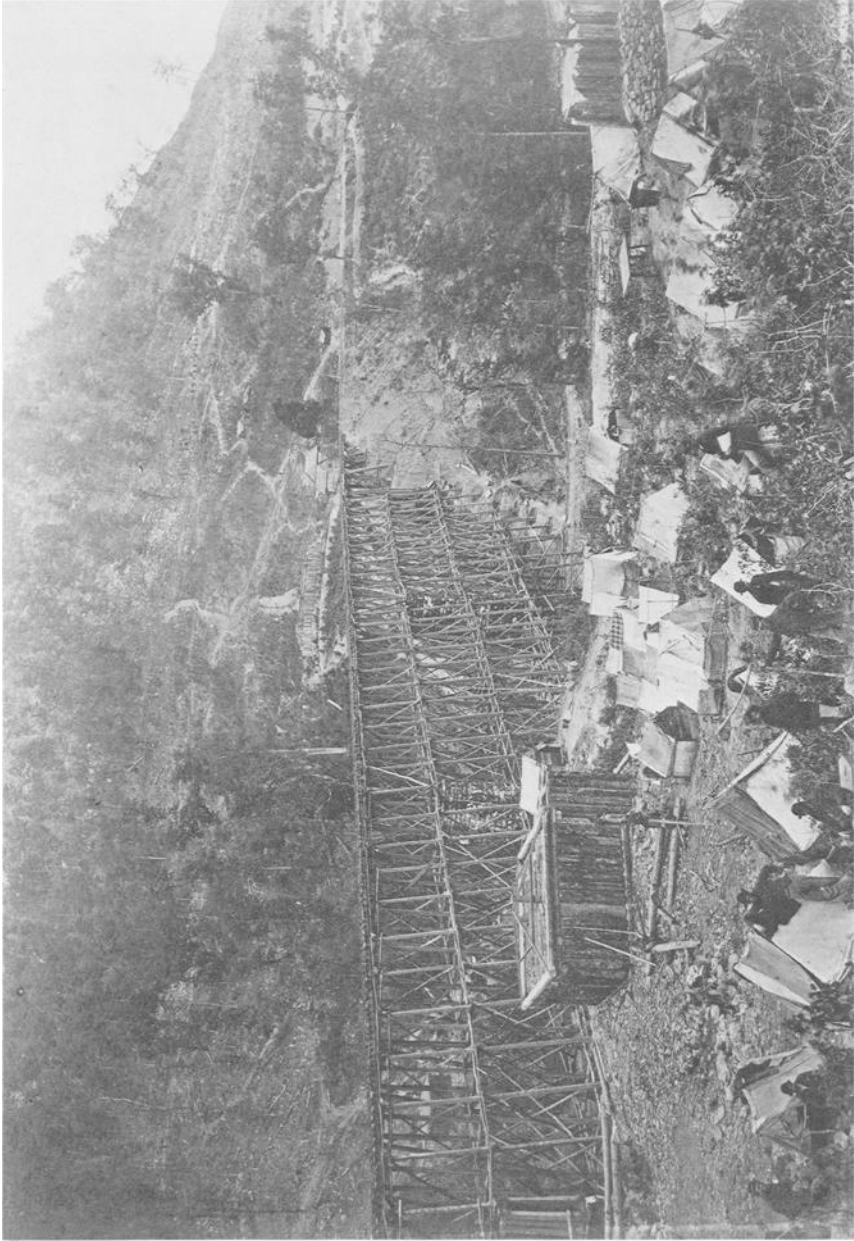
Pass in the Raccoon Range. Whiteside No. 1. Plate 6. Photographic Views of Sherman's Campaign (Library of Congress. B8184-10011).
